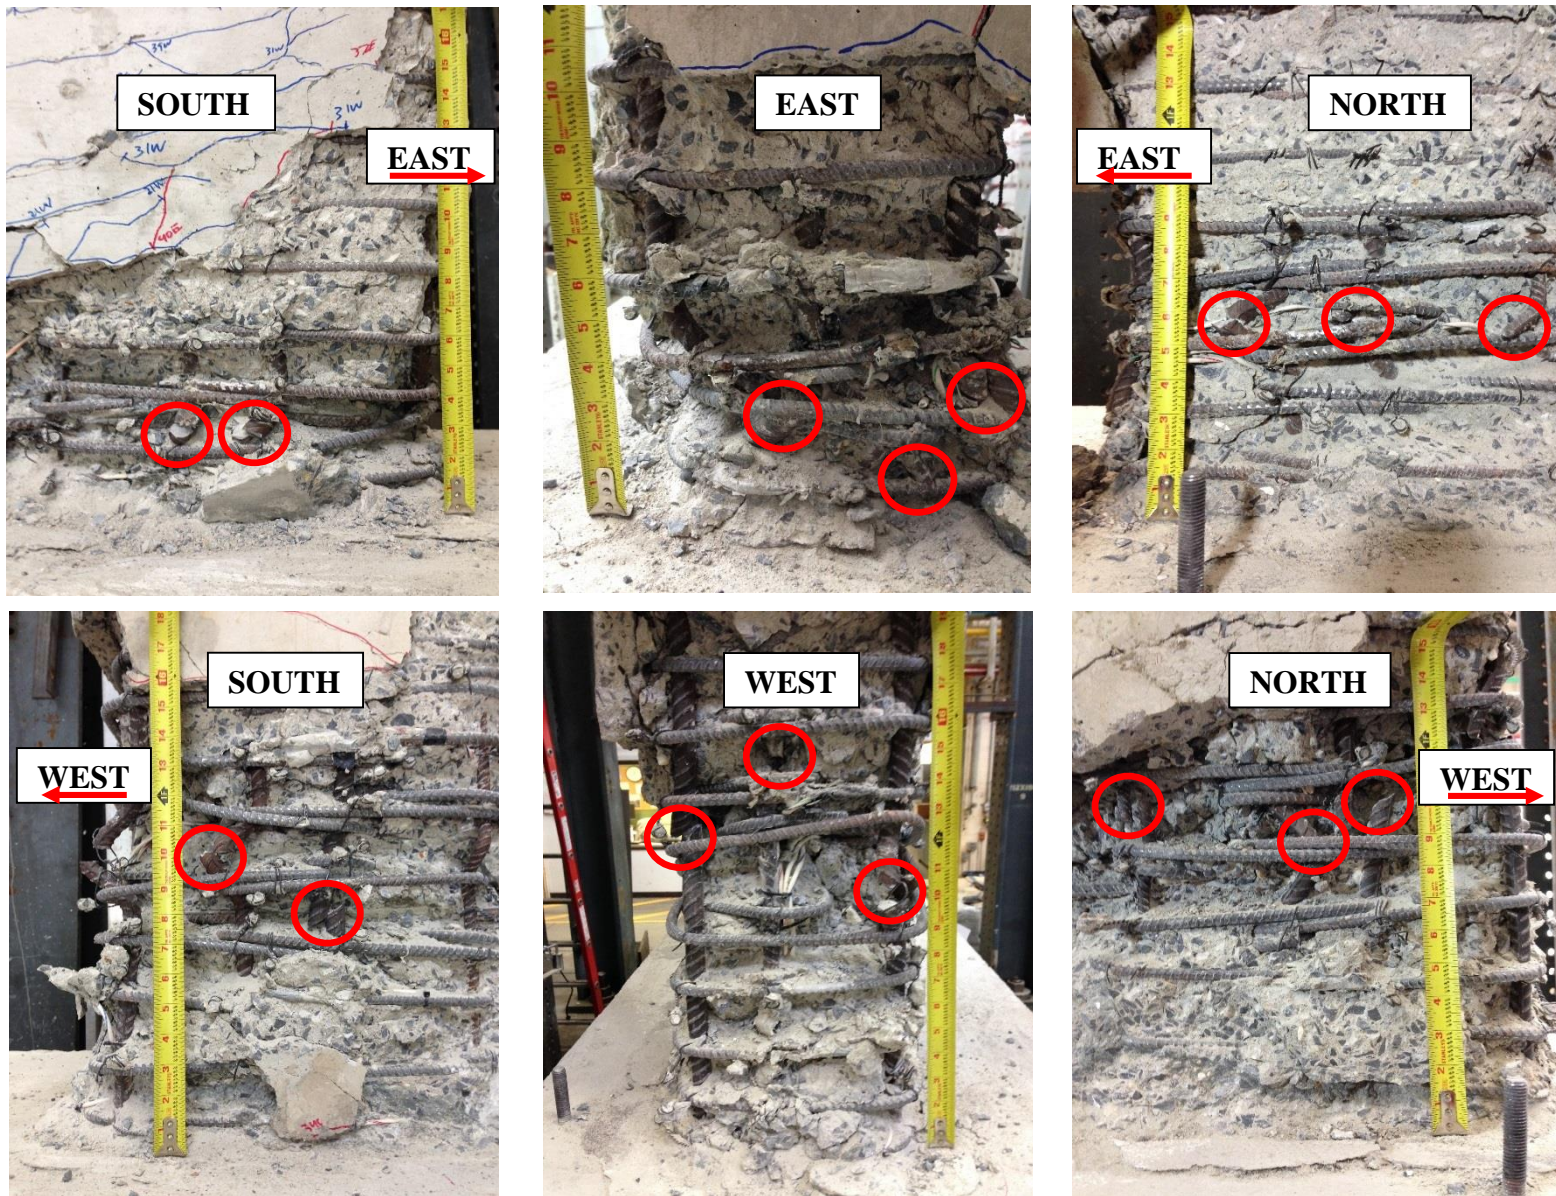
Photographs of observed fracture of longitudinal steel reinforcement at the end of the test Wall 2
